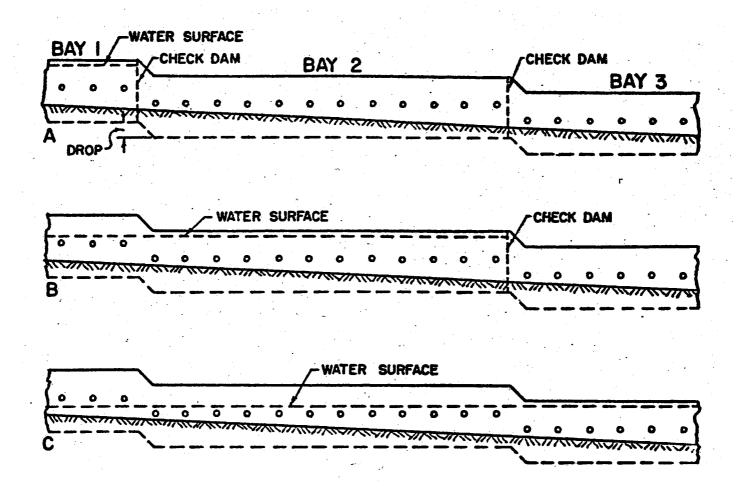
Elevation Drawing of a Cut-Back Furrow Irrigation System Using one Cut-Back
